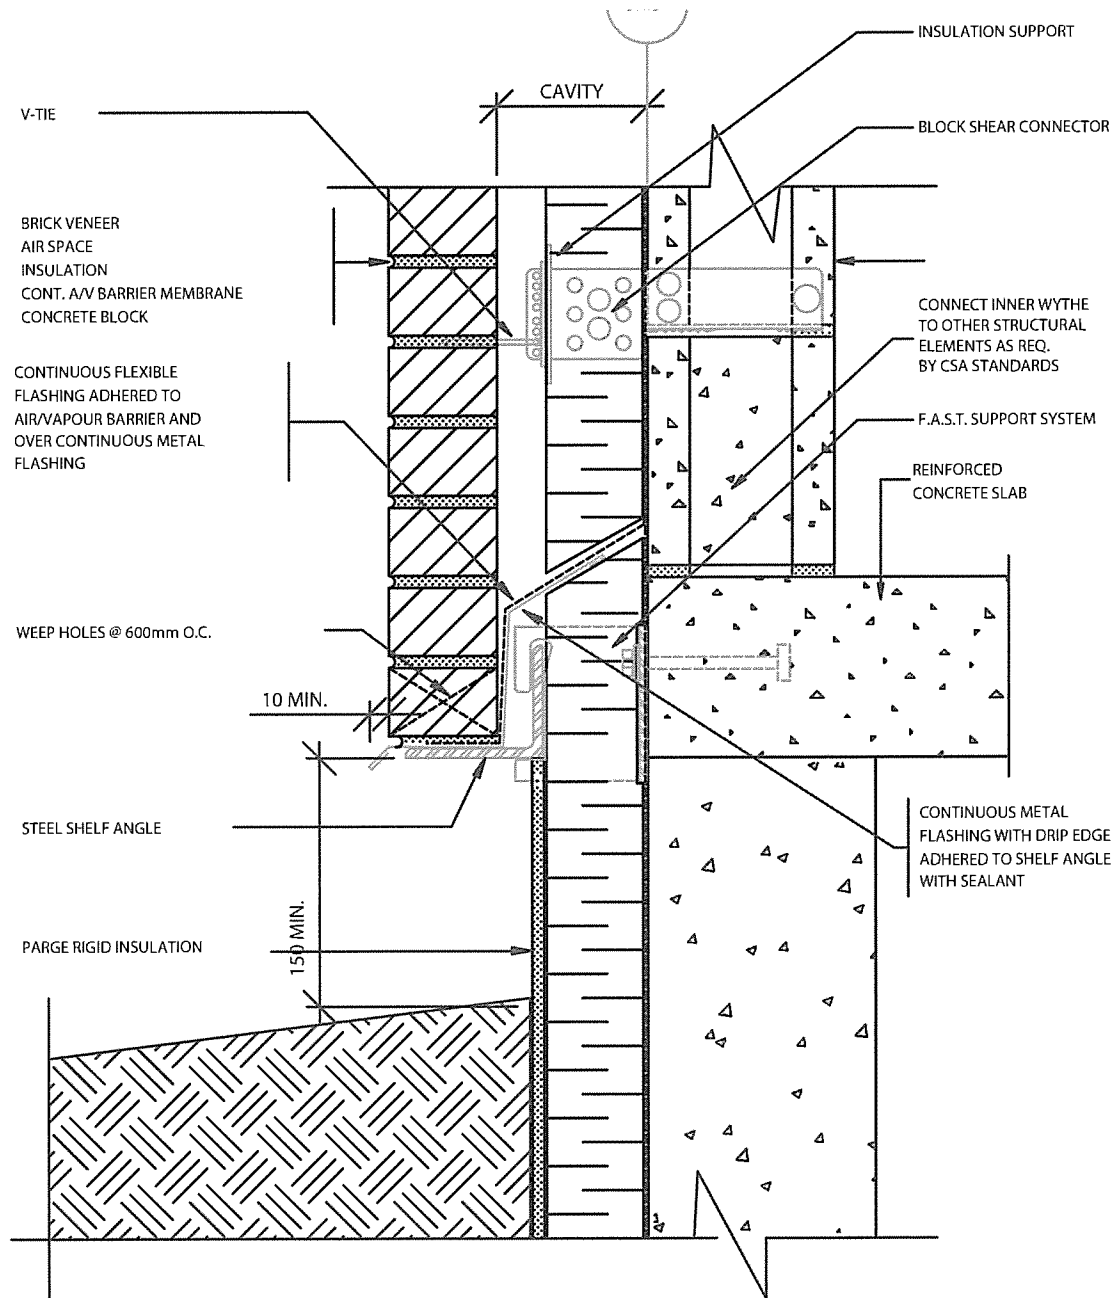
BRICK VENEER/CONCRETE BLOCK DETAIL AT FOUNDATION
